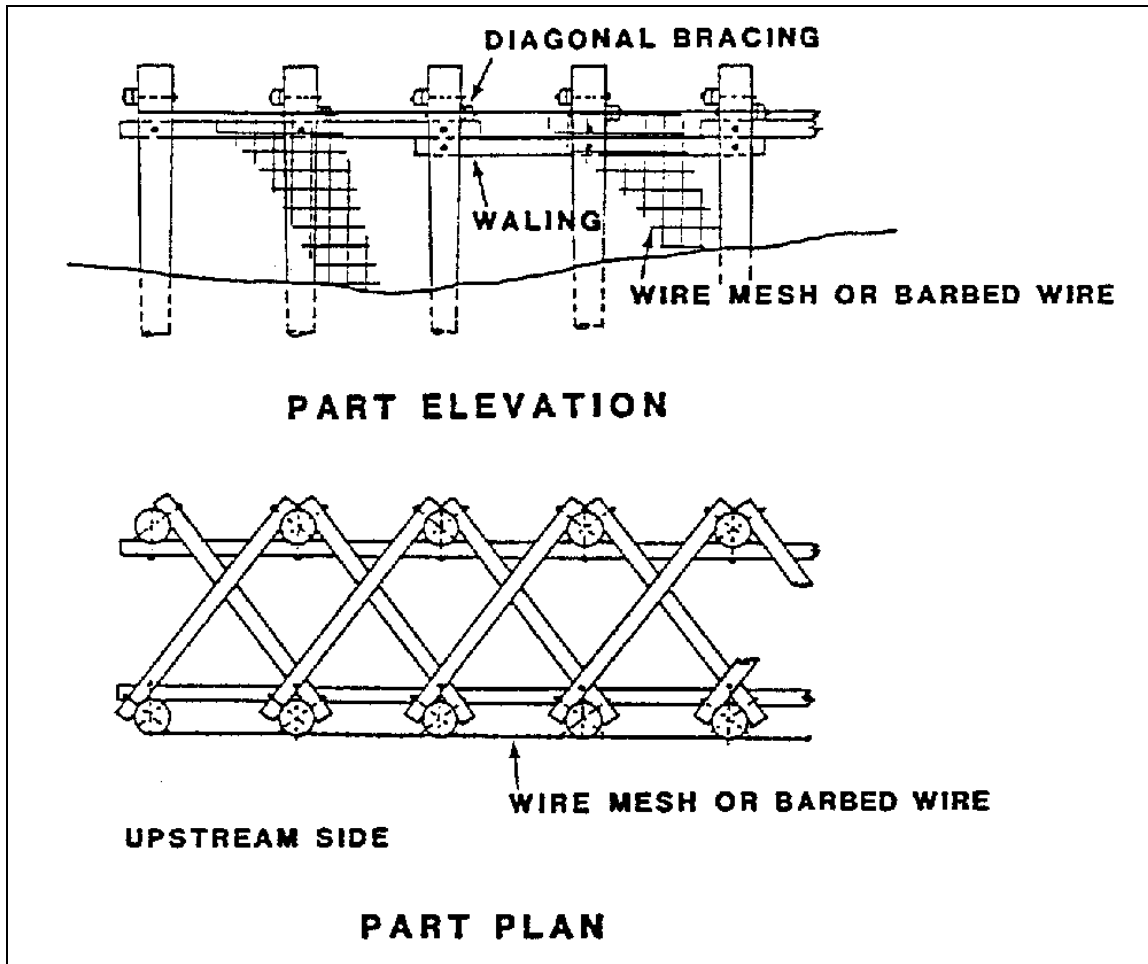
Timber pile bent retarder structure (after Brown 1985).
